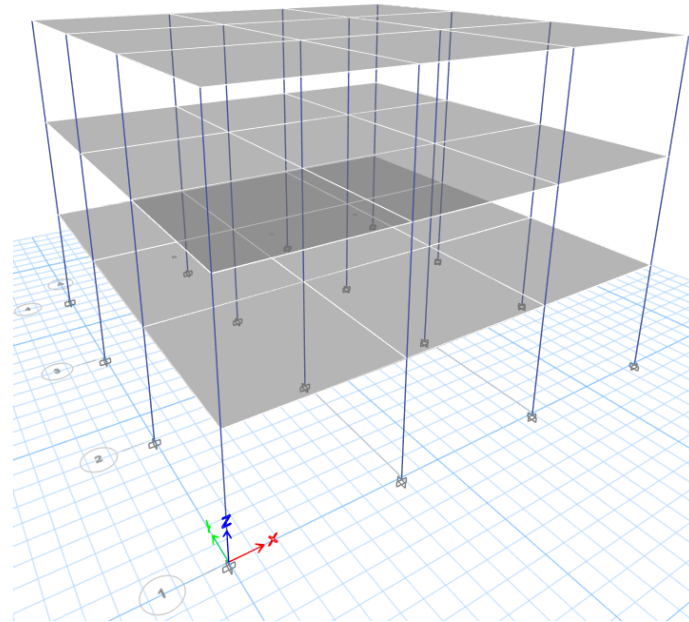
Finite element modelling of 3 storey 3 bay 4m bay length model
